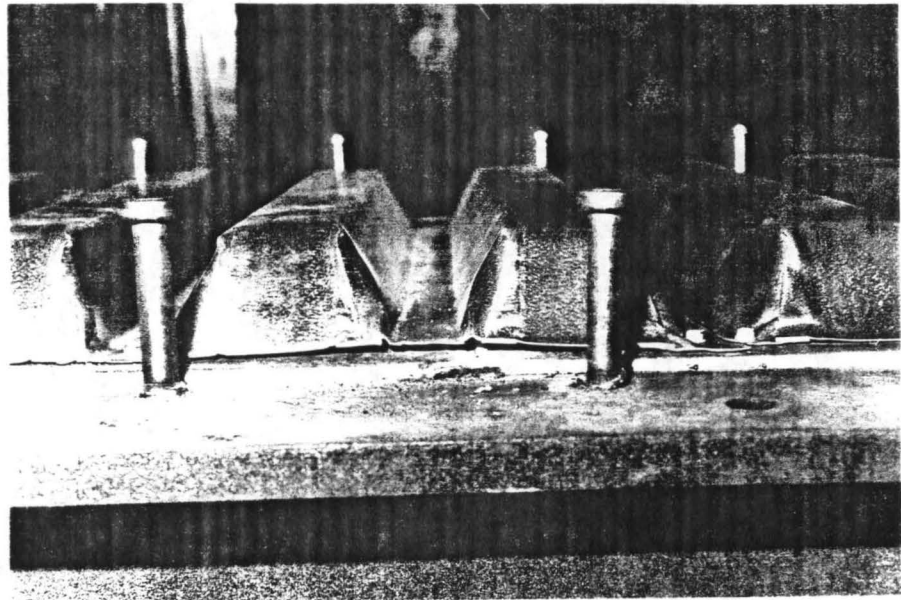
Upward Lifting of Bridgform Between Fasteners Over the Outside Web at a Load of 20 Kips
